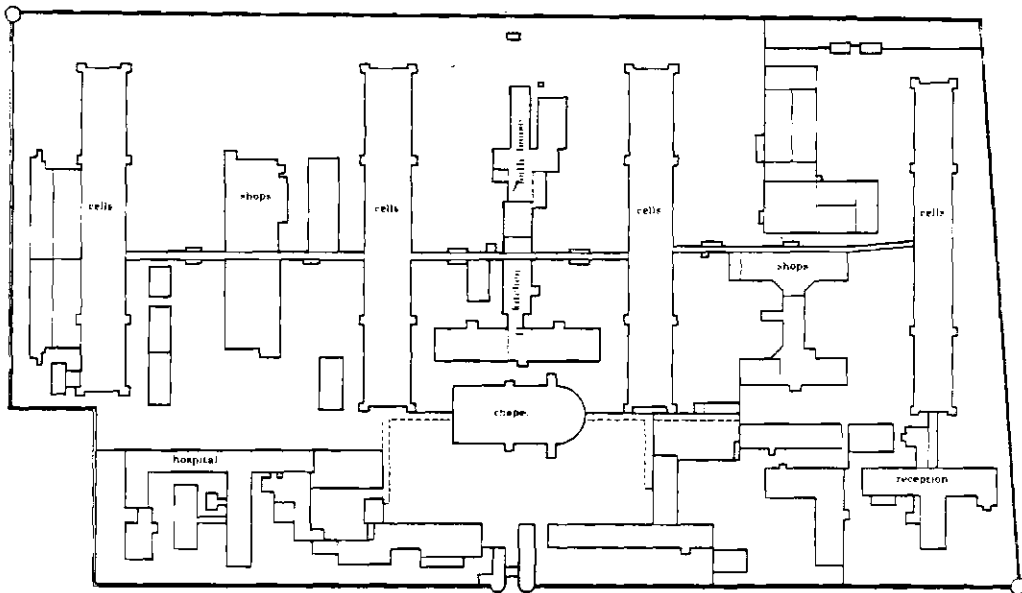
Wormwood Scrubs - Detached Pavilions or Telephone Pole Plan (Source: Johnston, 1973)
